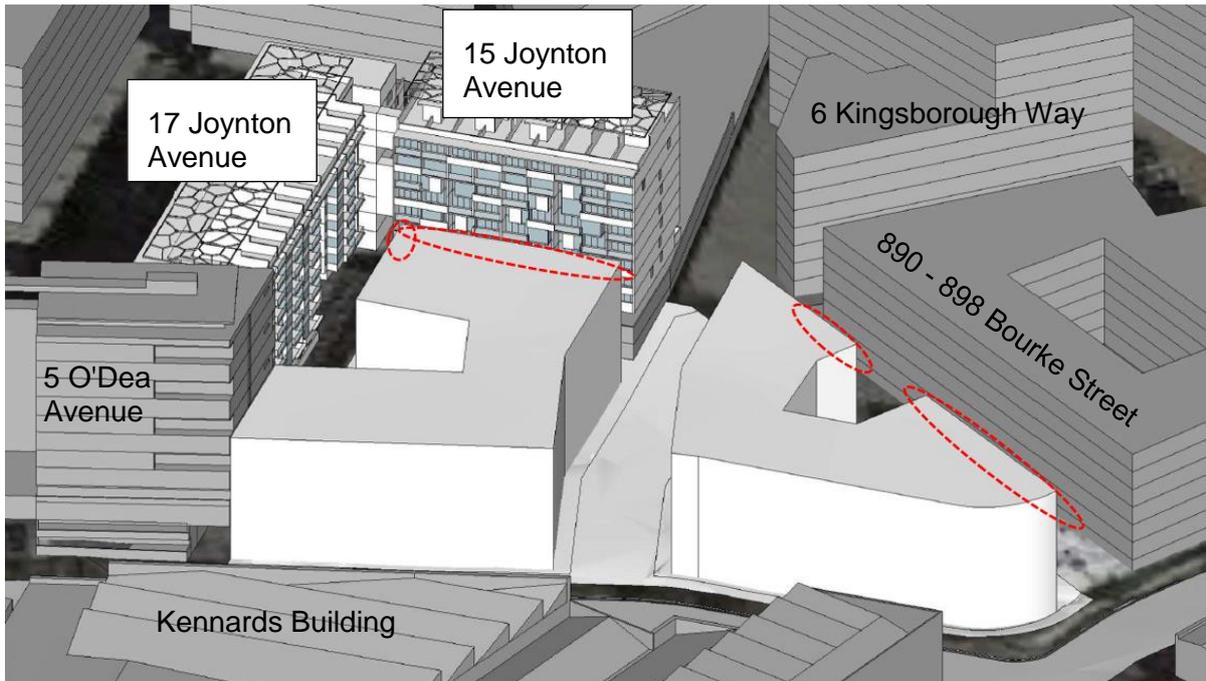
Sun's eye diagram of the proposed building envelopes with 6m upper floor setback at 11.30 am mid-winter
